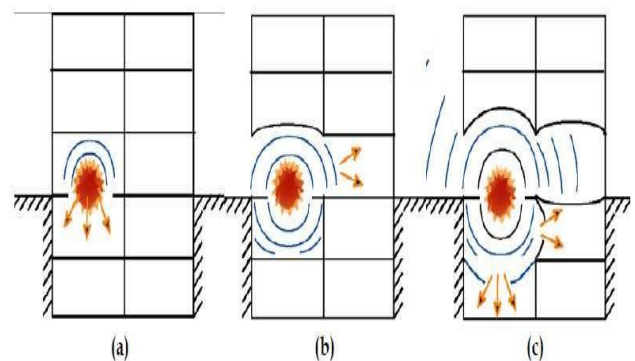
Sequence of Building Damage Due to An Internal Blast Within a Building: (A) Local Damage of Floor, (B) Uplift of Floor Above, and Failure of Walls Windows, and (C) Venting of Pressured Air Through the Various Levels of The Building
